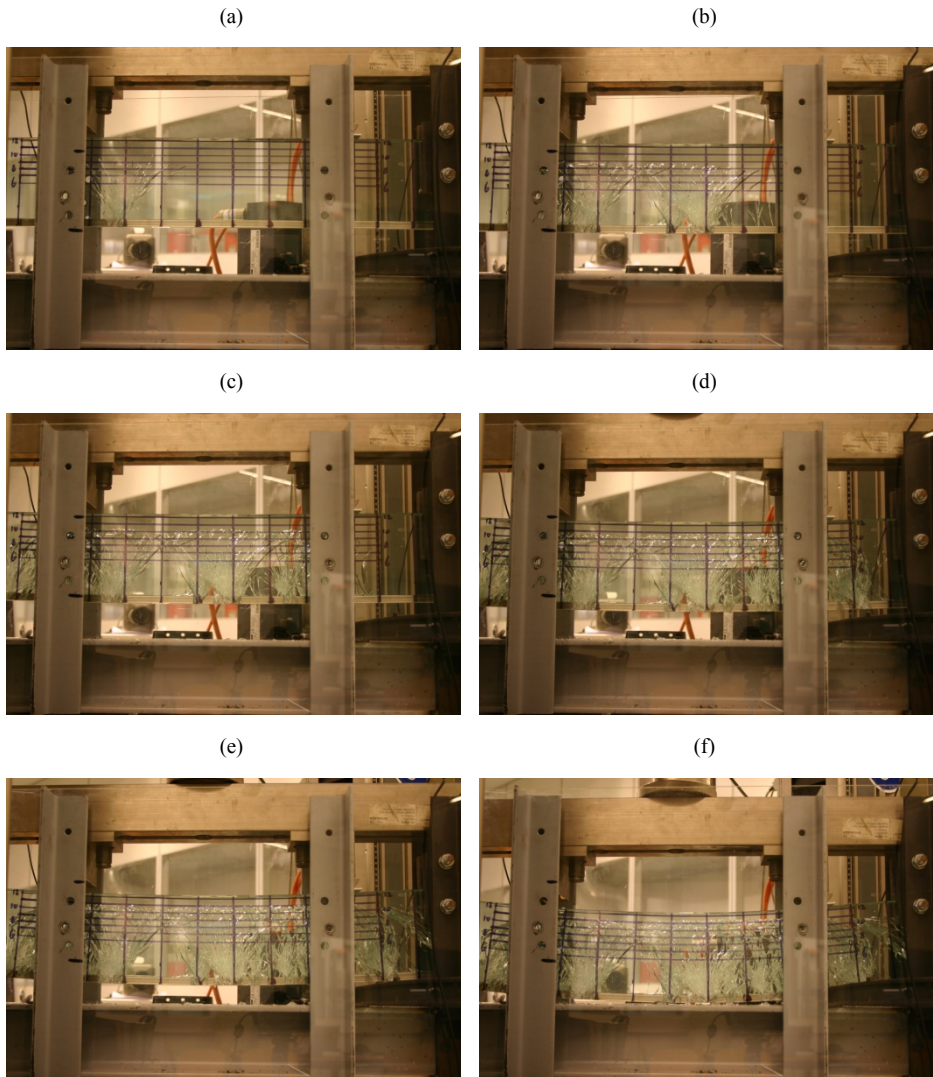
Photo sequence of an exemplary bending test on a 1.5 m SG-laminated reinforced glass beam, with hollow section reinforcement.
